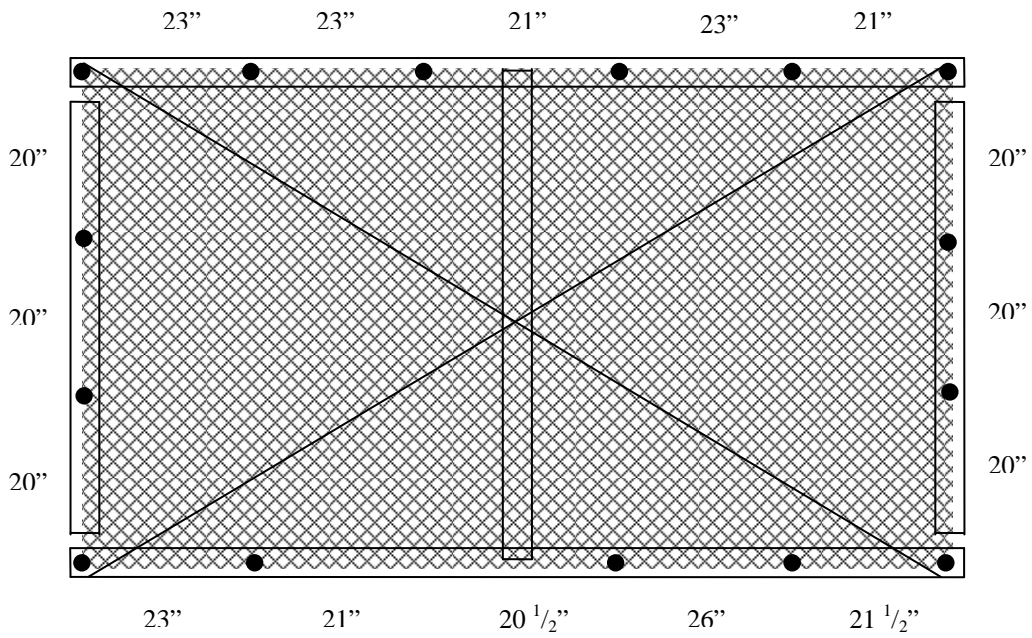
Weld Spacing for Series 2 Tests on Frame 2
